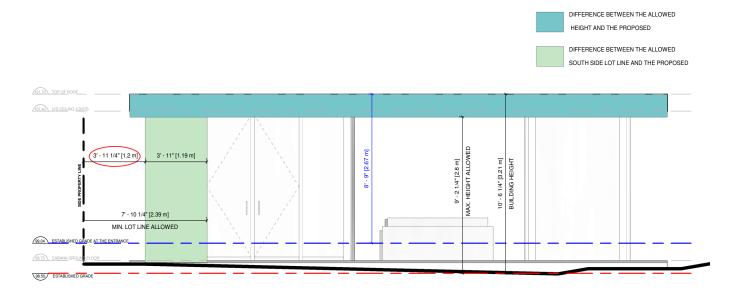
Proposed East (Front) Elevation With Interior Lot Line Setback.
